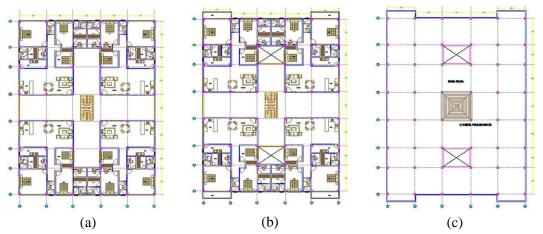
Typical architectural (a) first floor, (b) mezzanine floor (c) roof.
